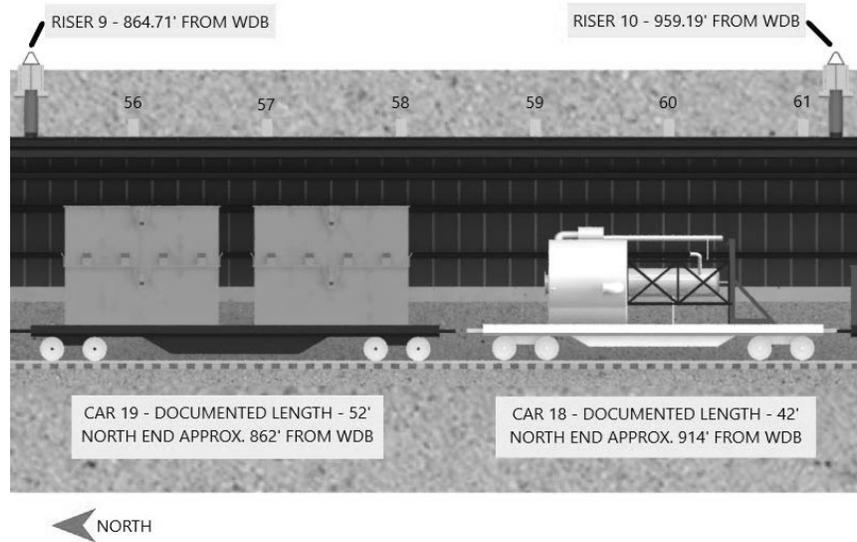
Riser 9 to Riser 10 Tunnel Section.
